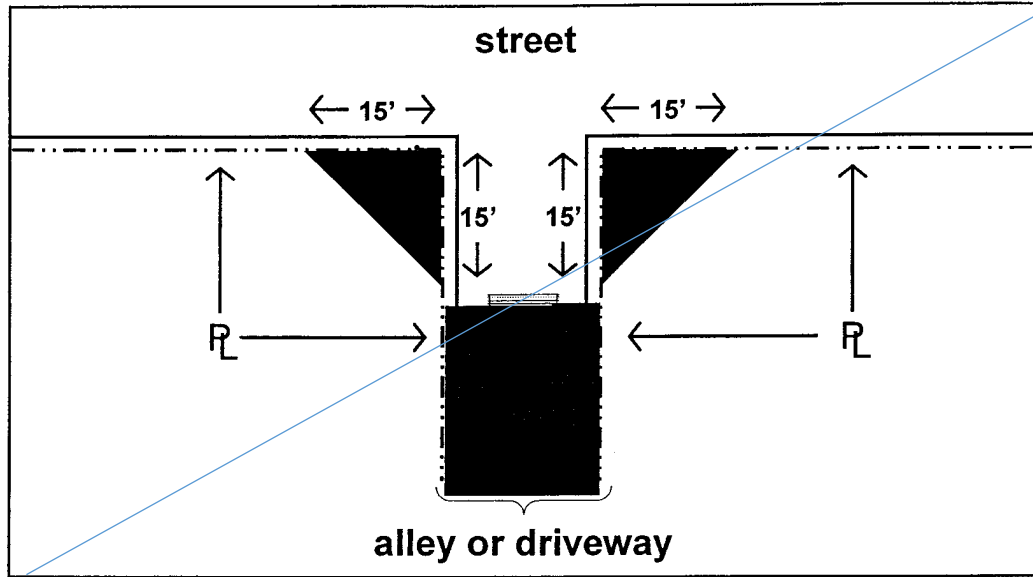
Sight Triangle Area at the Intersection of a Driveway or Alley and a Street (without a sidewalk or multi-use path)
